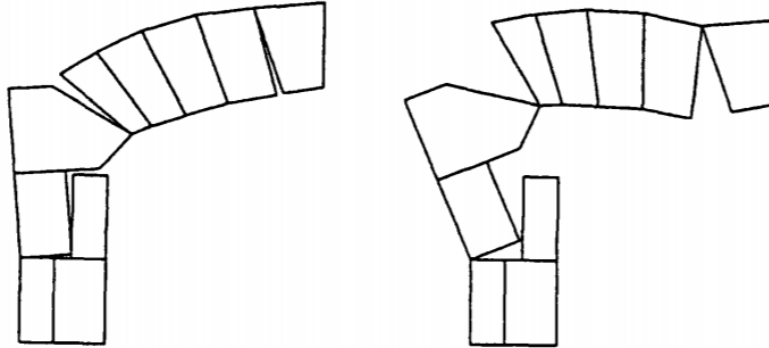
From [Mamaghani et al. \(1999\)](#): Failure mode of a masonry arch.
